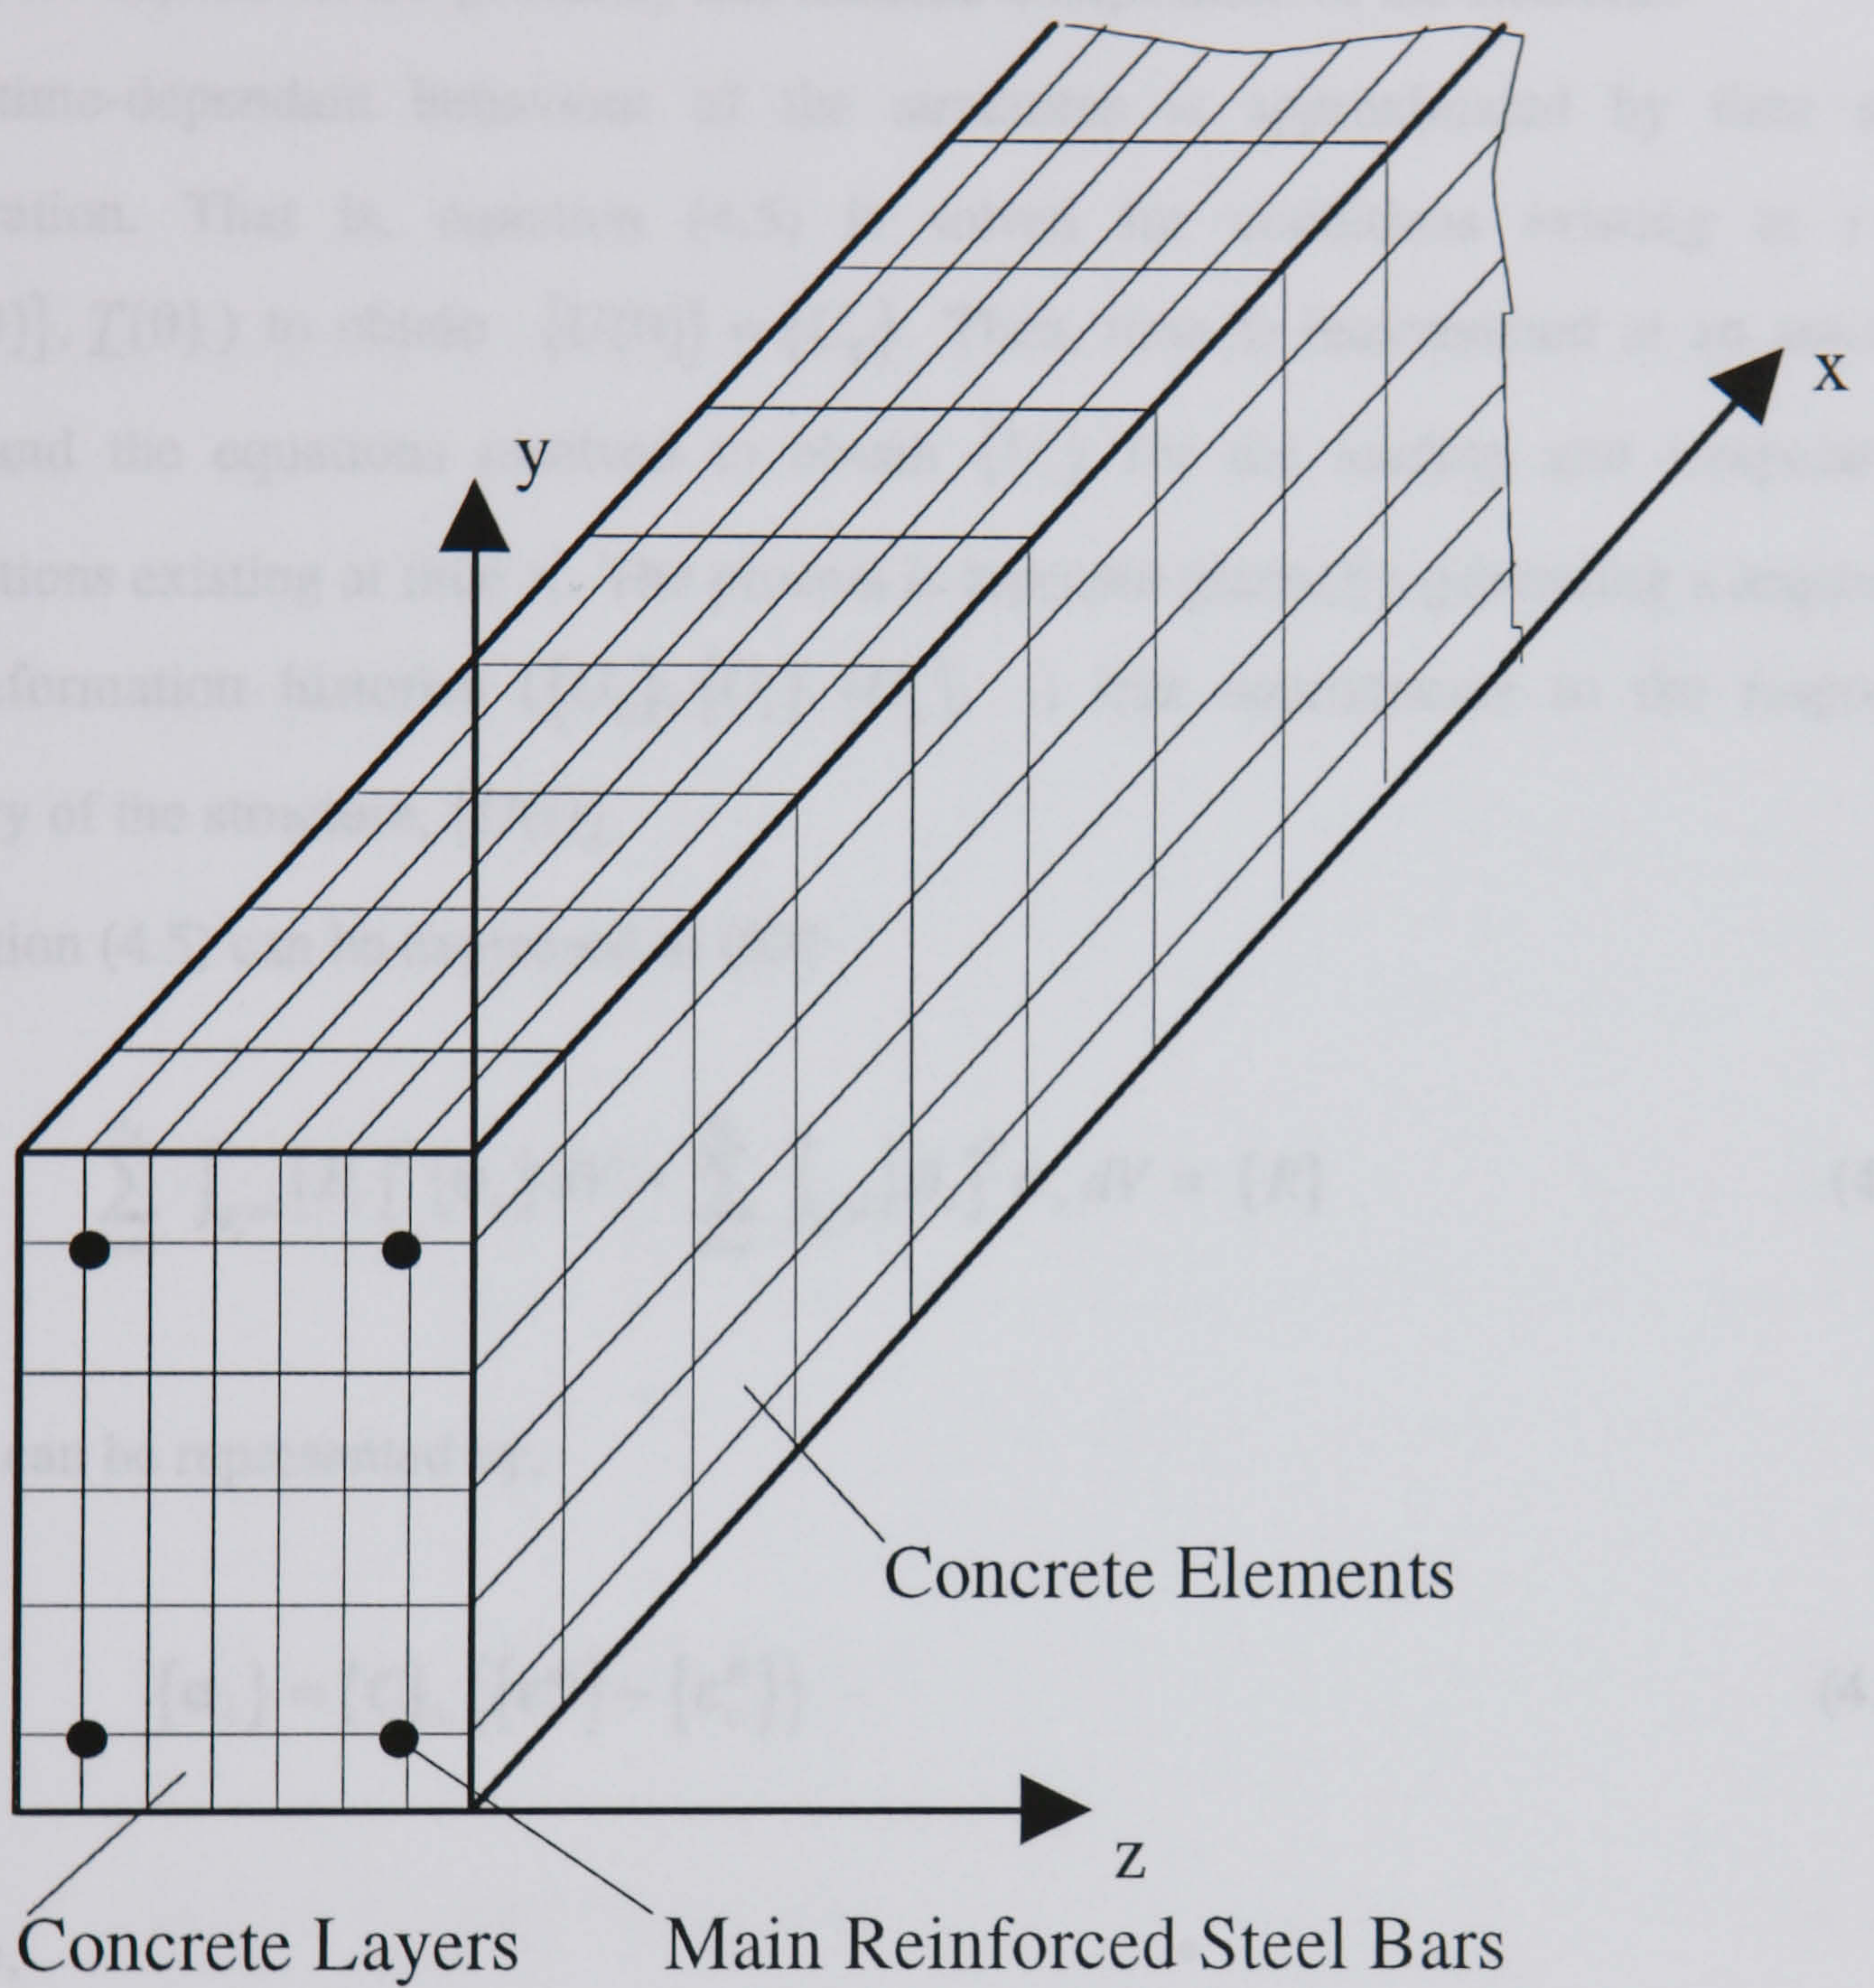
Division of Reinforced Concrete Member into Concrete and Main Reinforced Steel Bar Elements
